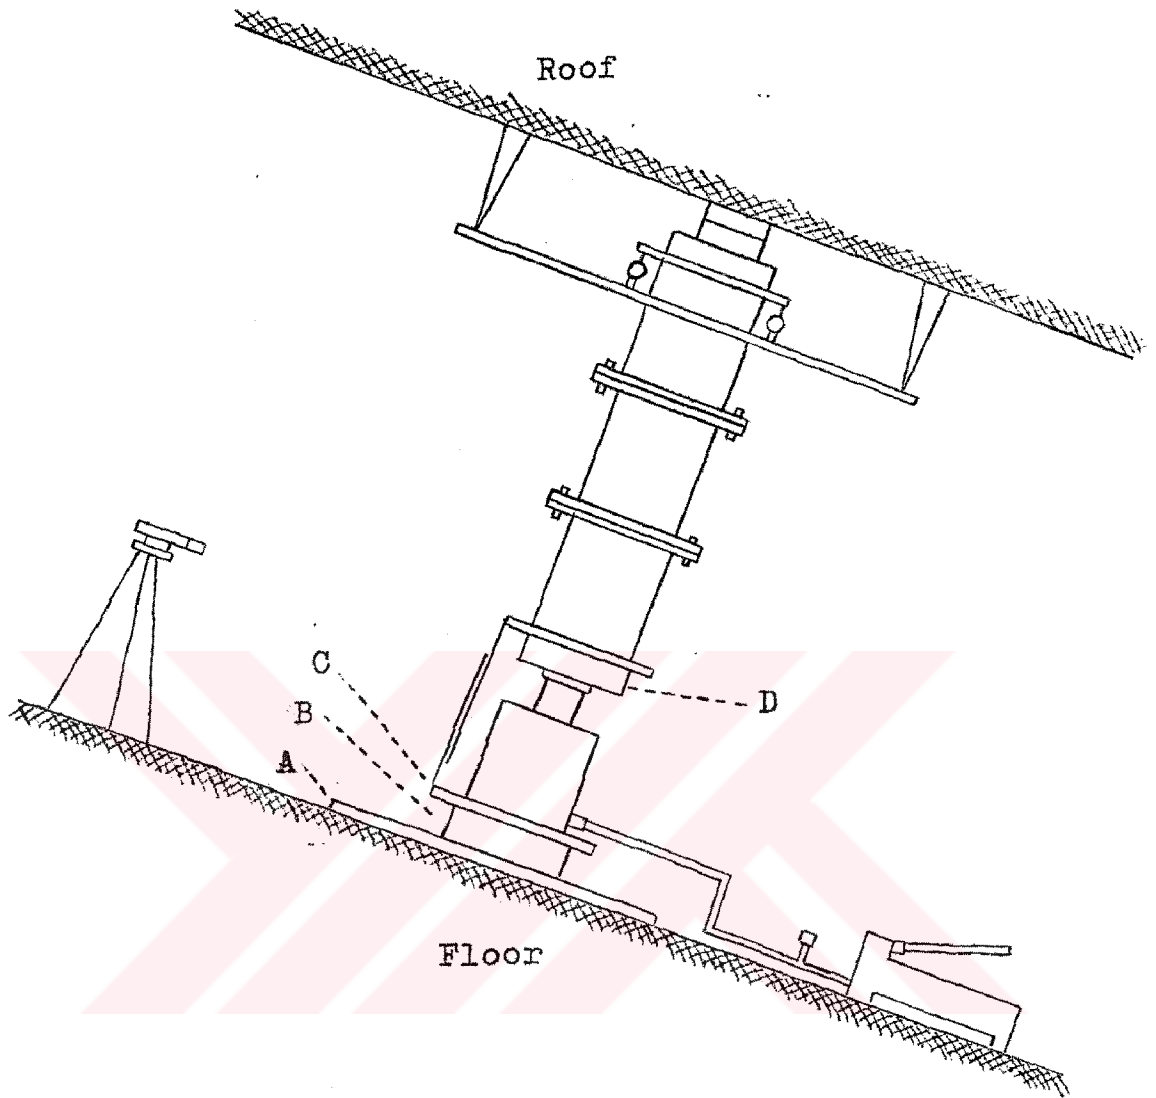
b. Plate loading test set-up for testing the roof strata (A,B,C, and D are specially prepared steel plates)
